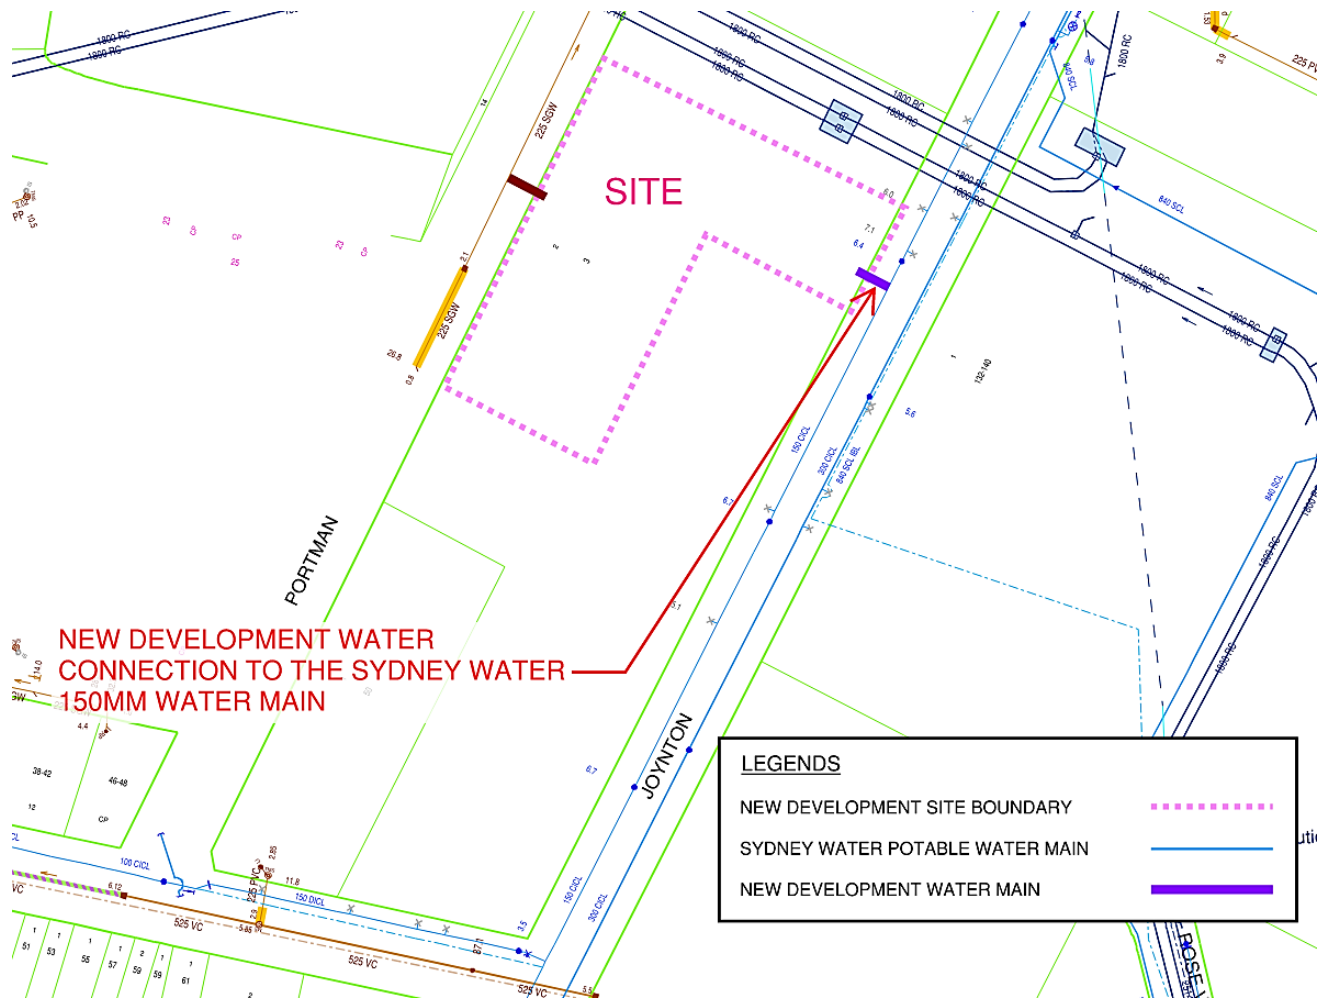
Connection to Sydney Water Potable Water Main – Extract from Sydney Water Assets Plan
